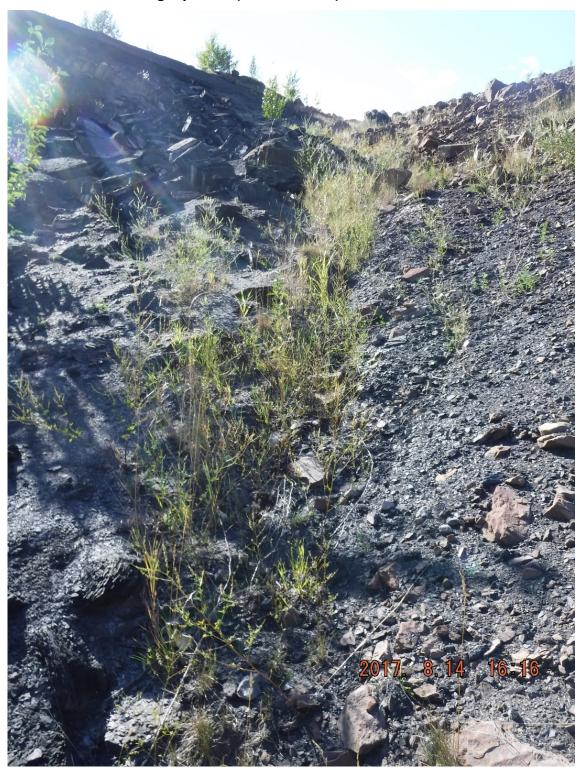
Seepage from low level outlet downstream of the dam (SNTD-2017-22)
